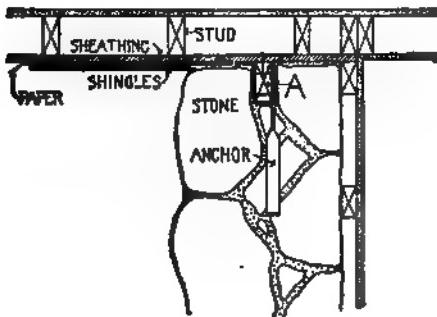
Method of Joining Outside Frame to Stone Walls.
